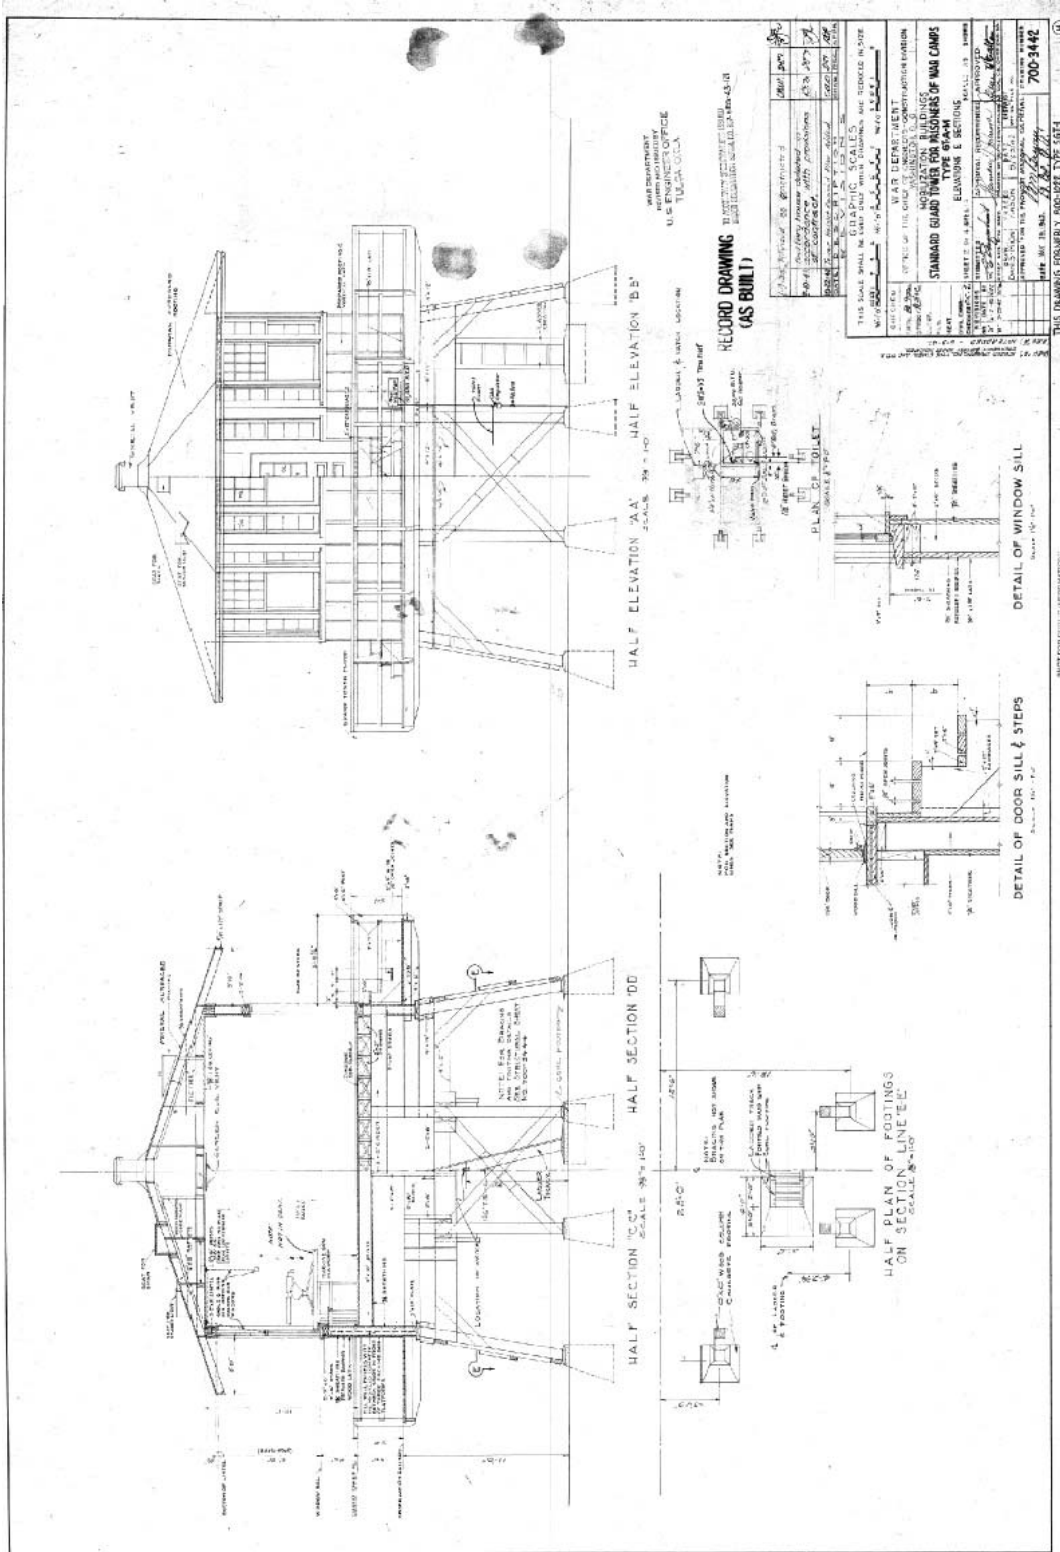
TYPICAL PLAN, GUARD TOWER FOR POW CAMP (FROM ARCHIVES OF CAMP GRUBER)
